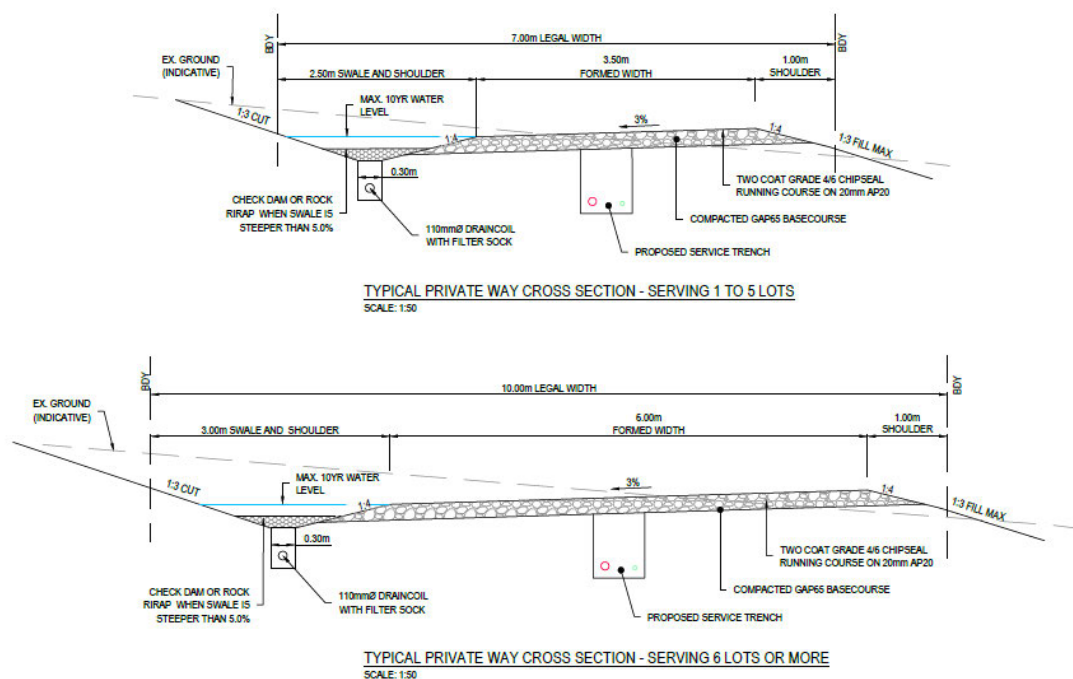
JOAL Standard Cross-sections showing the Grass Swale for Treatment
